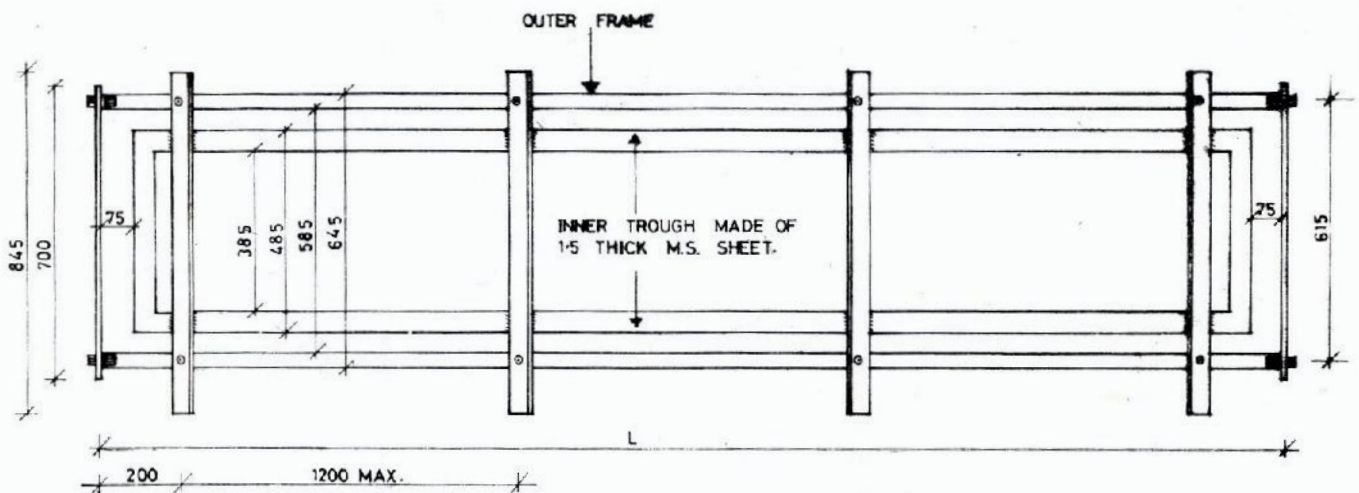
PLAN OF MOULD FOR R.C. CHANNEL UNIT
